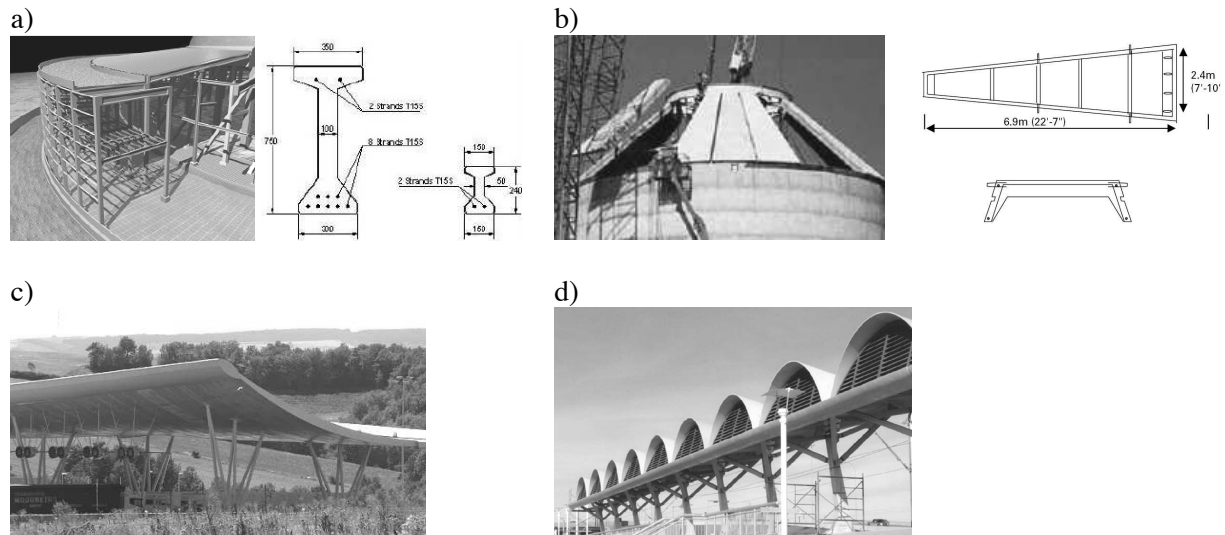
Application of UHPFRC: a) Cattenom nuclear power plant (1997-1998, France), with details of primary and secondary beam cross sections, [Acker, Behloul 2004]; b) roofing panels for silo (2001, Joppa, Illinois USA), with plan and cross section of element [Nowodworski, Rosiak 2002]; c) roof of Millau Viaduct tollgate (2004, France) [Dolo et al. 2005]; d) Shawnessy station (2005, Calgary, Canada), [Vicenzino, Culham 2005]
